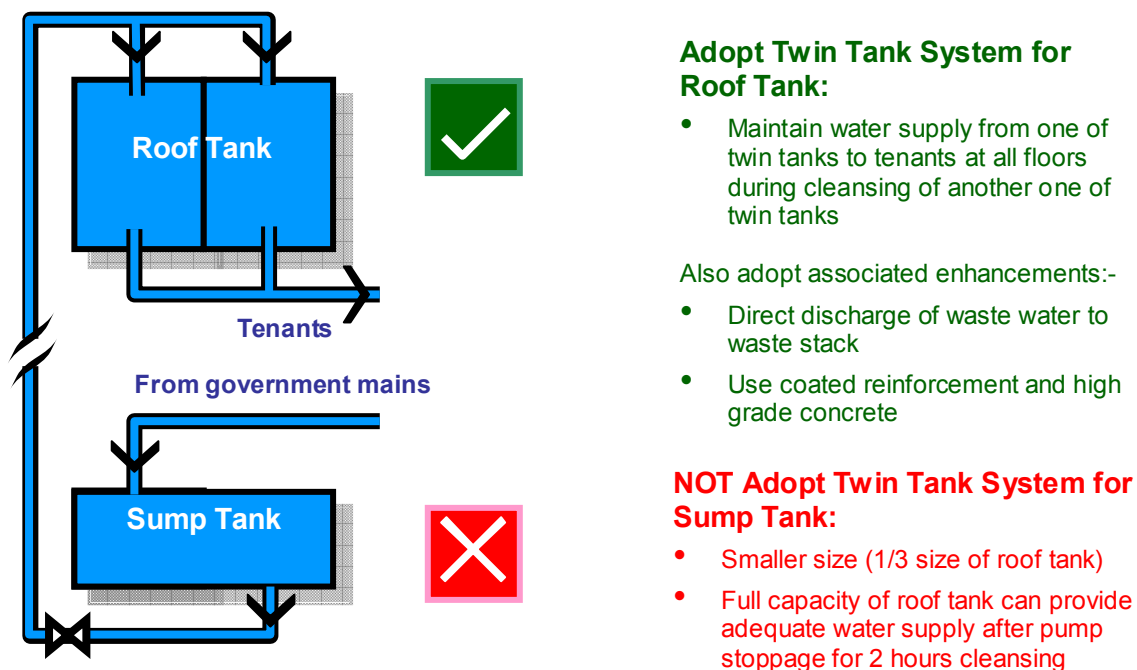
Assessment to Water Tanks at Roof and Sump Tank at G/F in form of Twin Tanks
